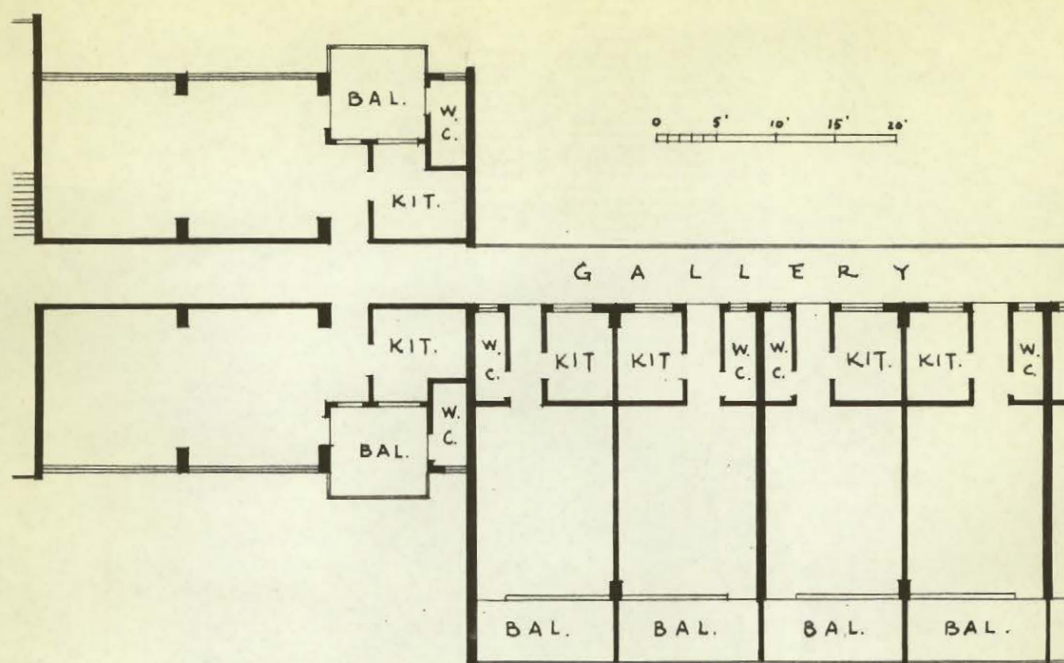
Plan of Typical Flats, Sai Wan Cheun.
